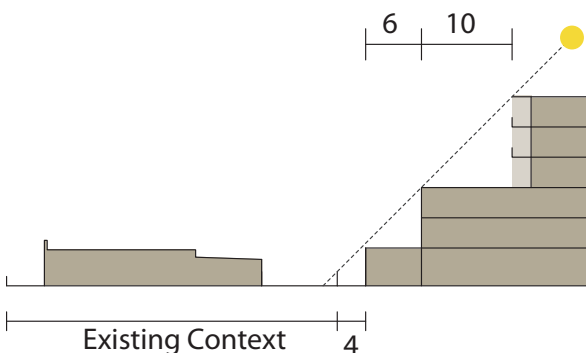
Little Hardiman Street setbacks to retain solar access to private open space of properties fronting Hardiman Street.
